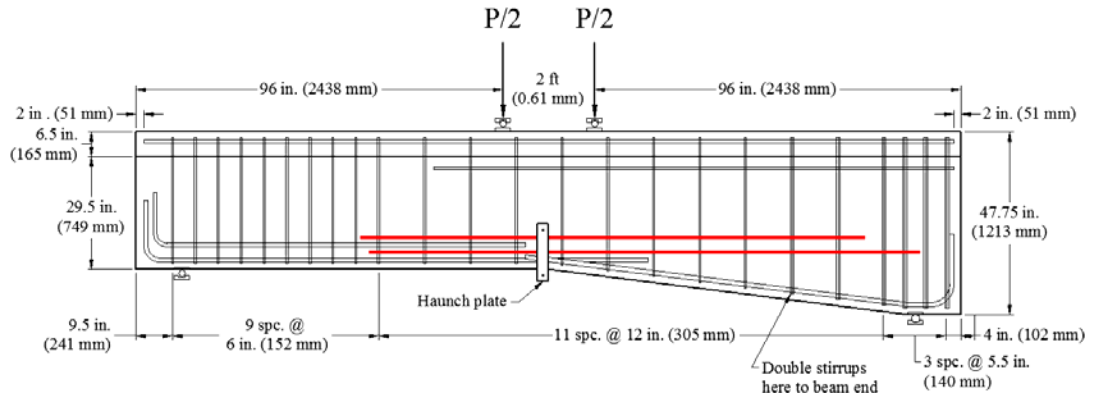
Retrofit specimen geometry and stirrup spacing
